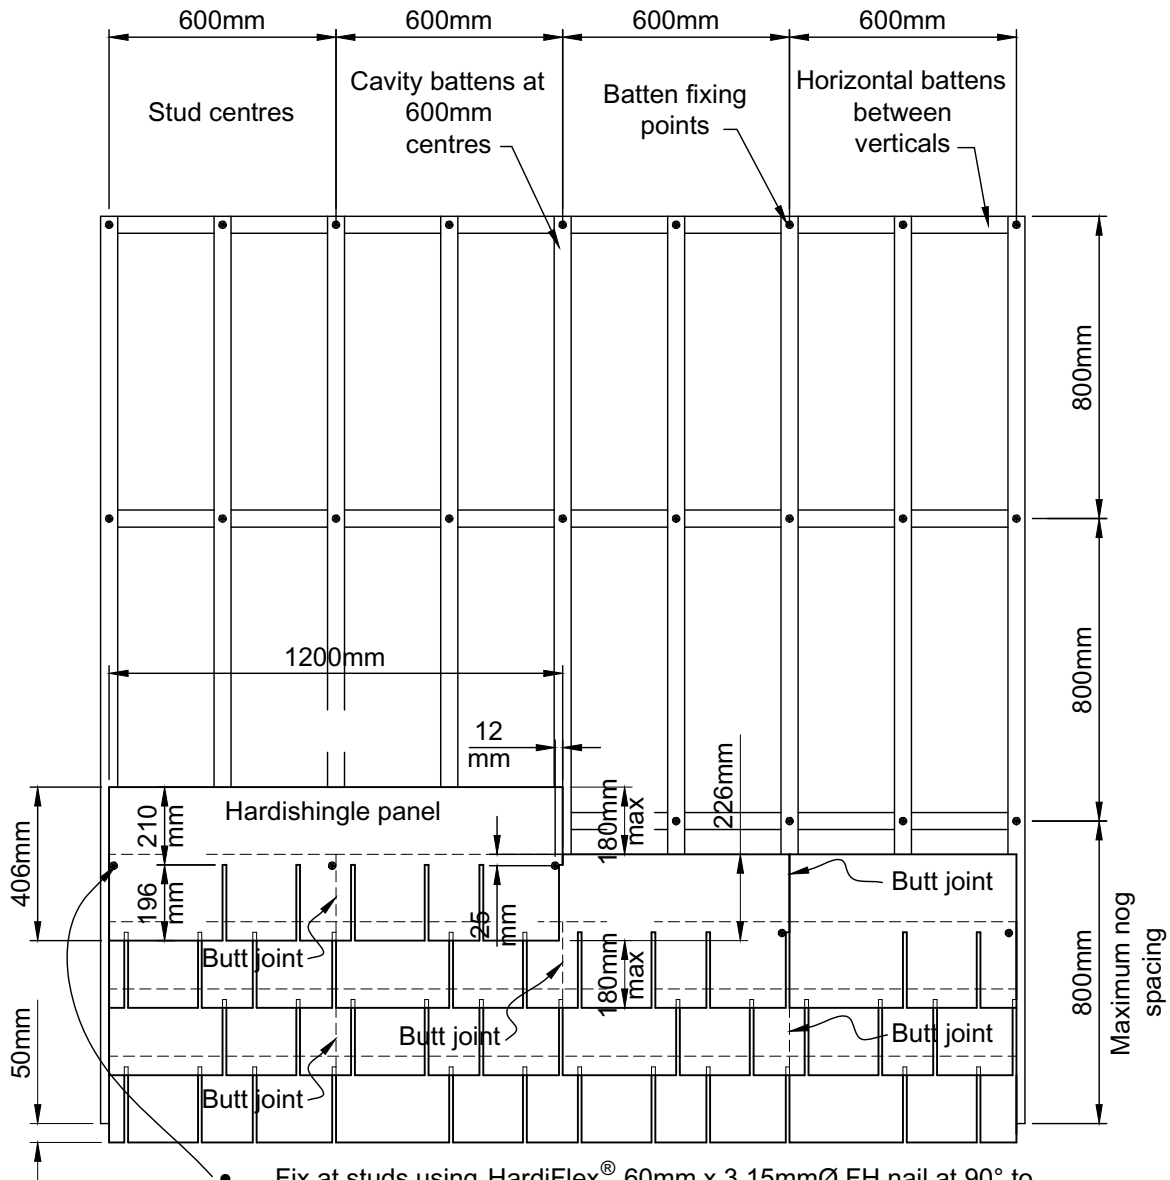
SHINGLESIDE STRAIGHT EDGE PANEL LAYOUT
